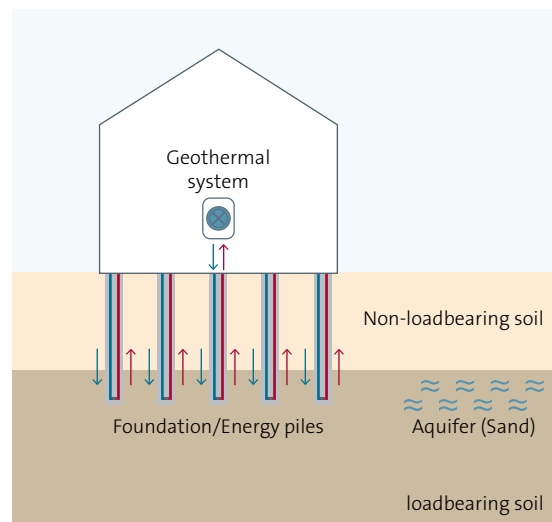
Building with Geothermal Energy Supply; source: ERGO
